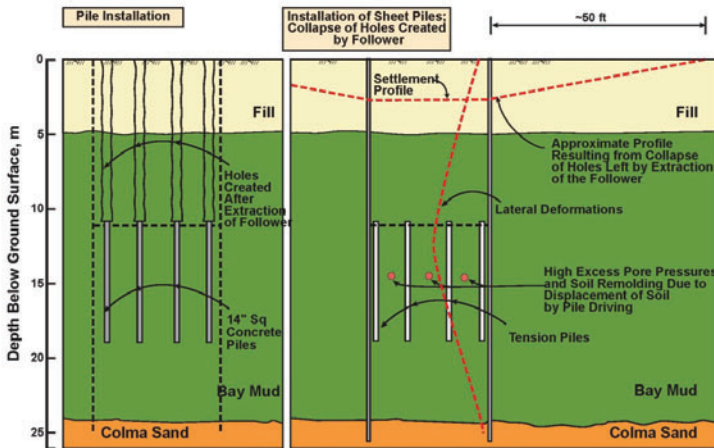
Typical Lateral Deformation Profiles: Pile Driving using Predrilling and Followers: MMT Excavation – San Francisco
